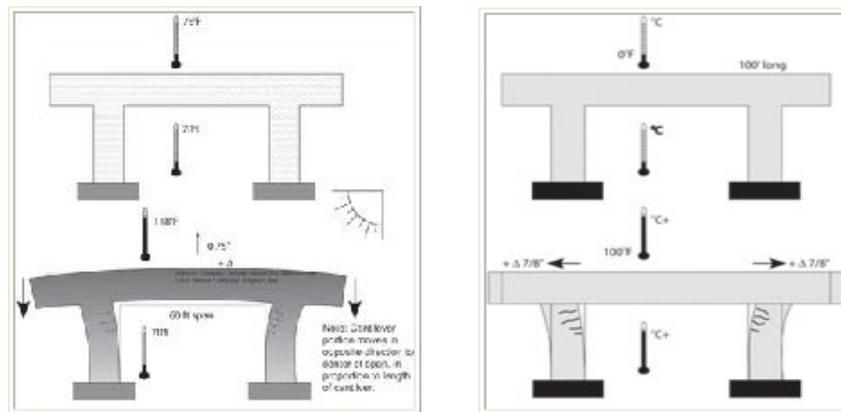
Cracking of masonry wall due to thermal movements of an overlying slab (Dilrukshi & Dias 2008)
